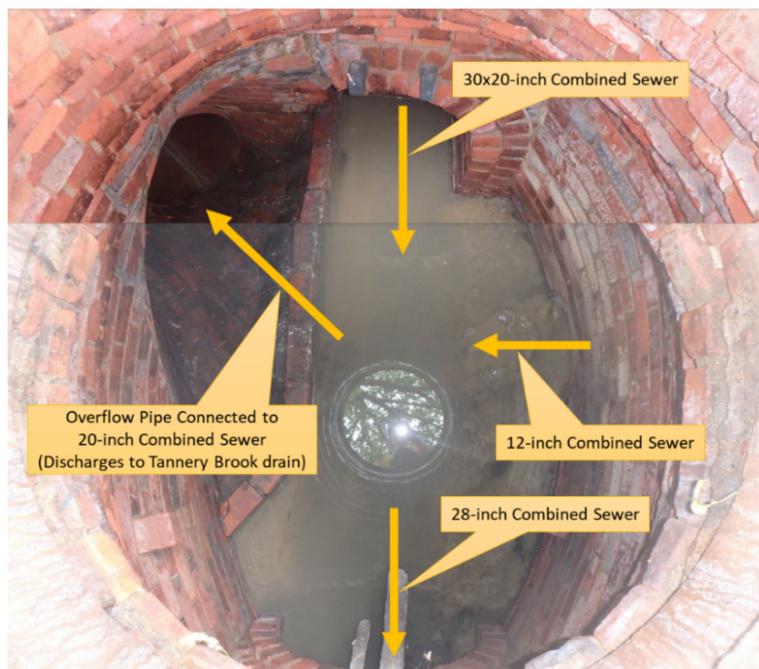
Manhole interior showing overflow pipe connection at Mead St. and Cameron Ave. (Photo taken from Somerville GIS – Manhole ID: CA-786 / Note: photo stitched together)
